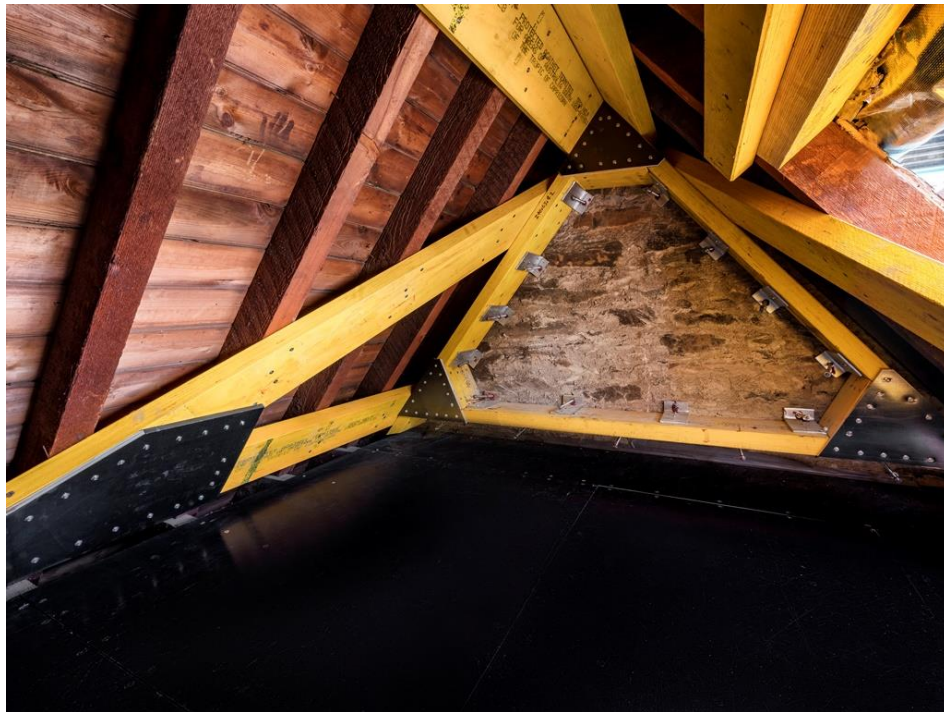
Internal view of gable wall strengthening. (Image courtesy of Chris Oaten, Insight Visuals)
